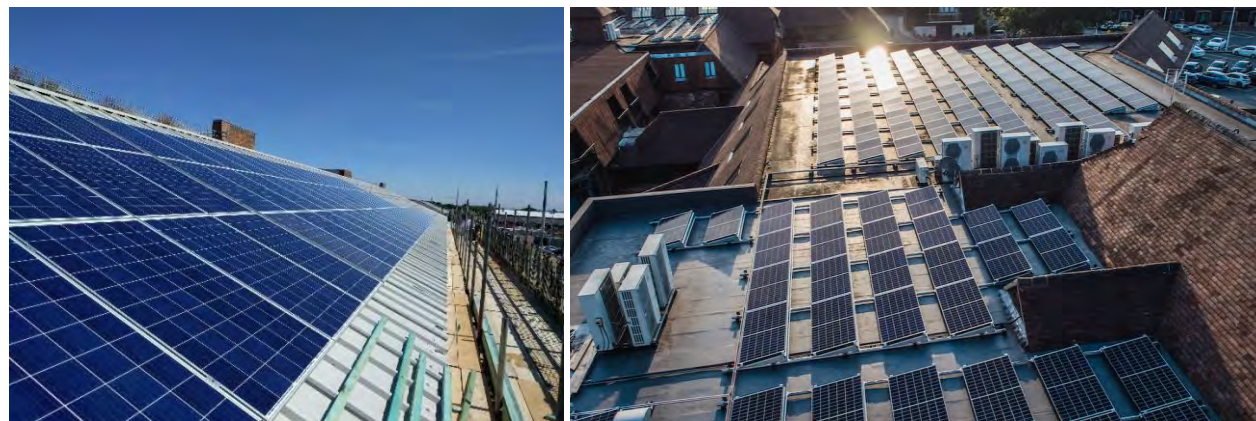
29 Example pitched rooftop solar PV (left) Example flat rooftop solar PV (right)
